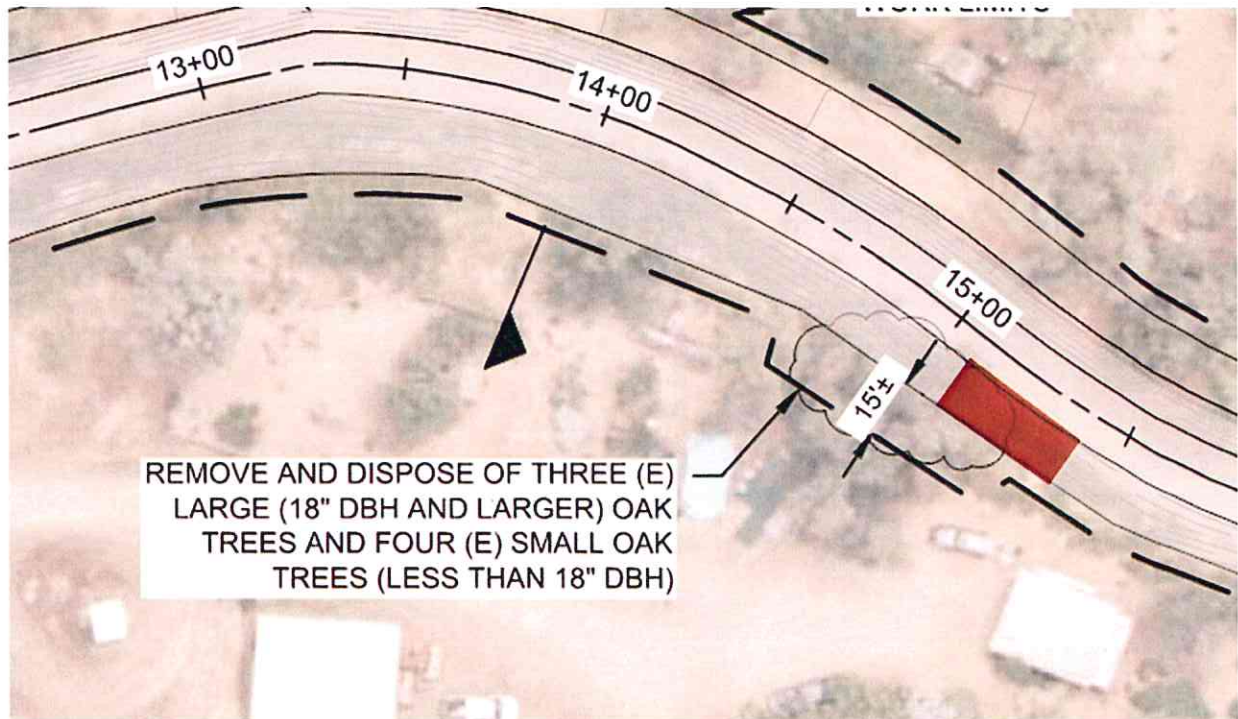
Approximate Location of Observed Shotcrete Cracking Highlighted in Red (South Hill Street Improvement Area)
